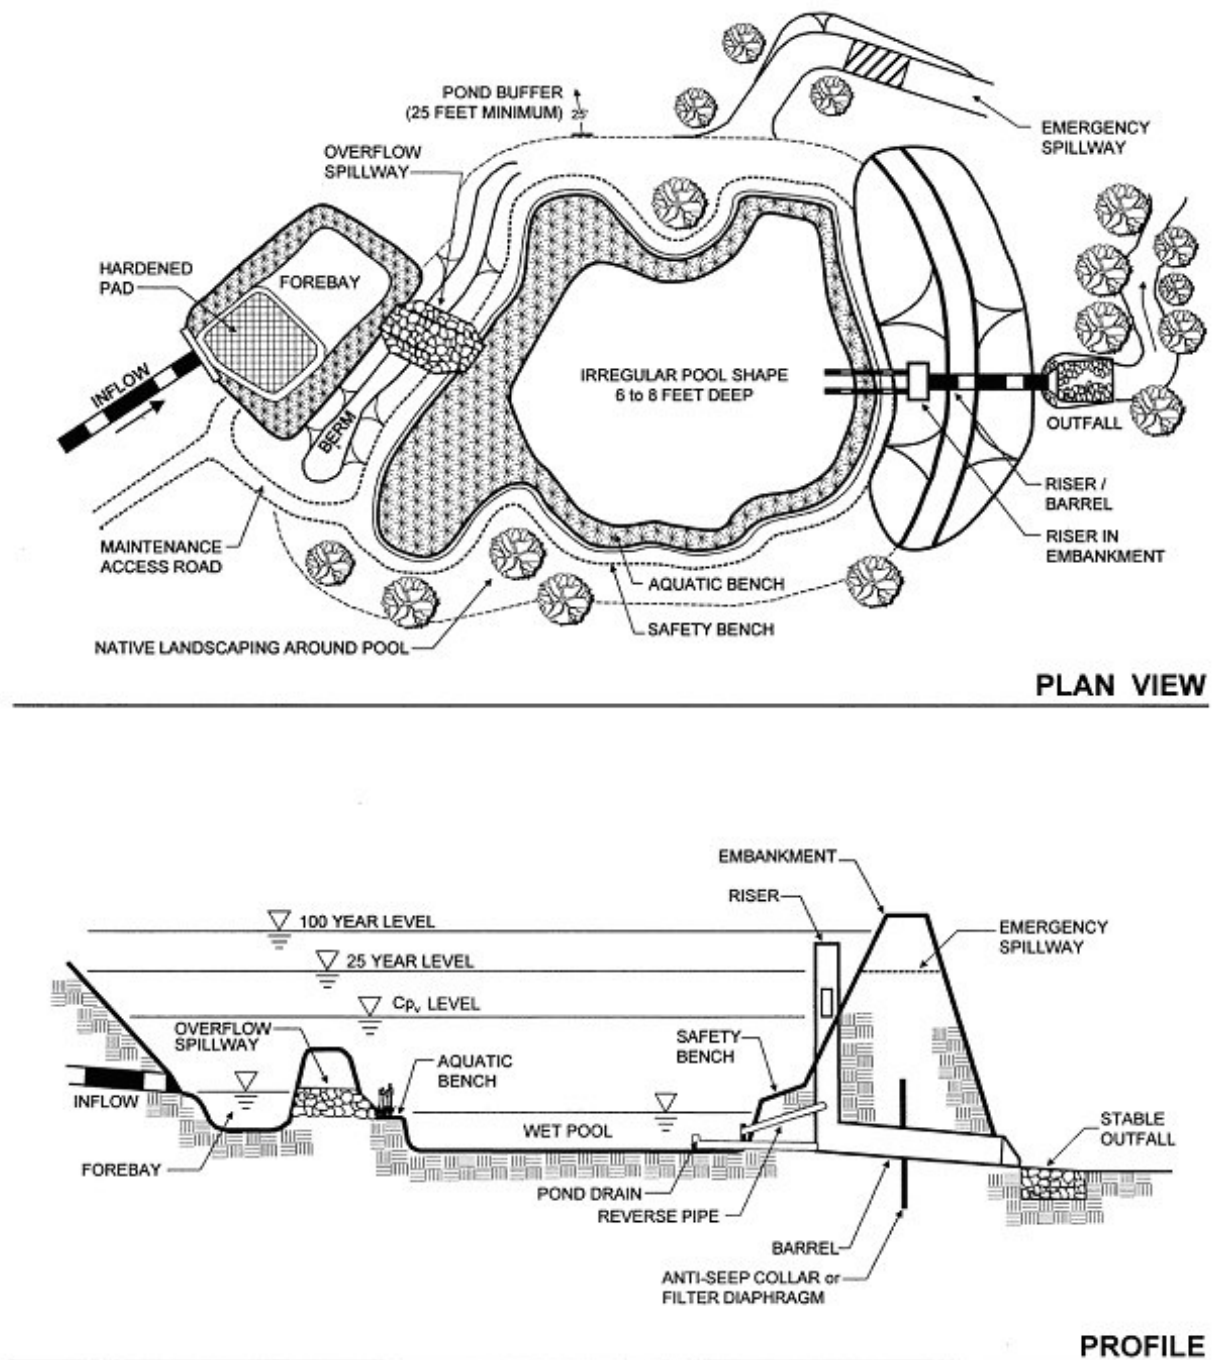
Wet pond detail. (Source: Center of Water Shed Protection)
